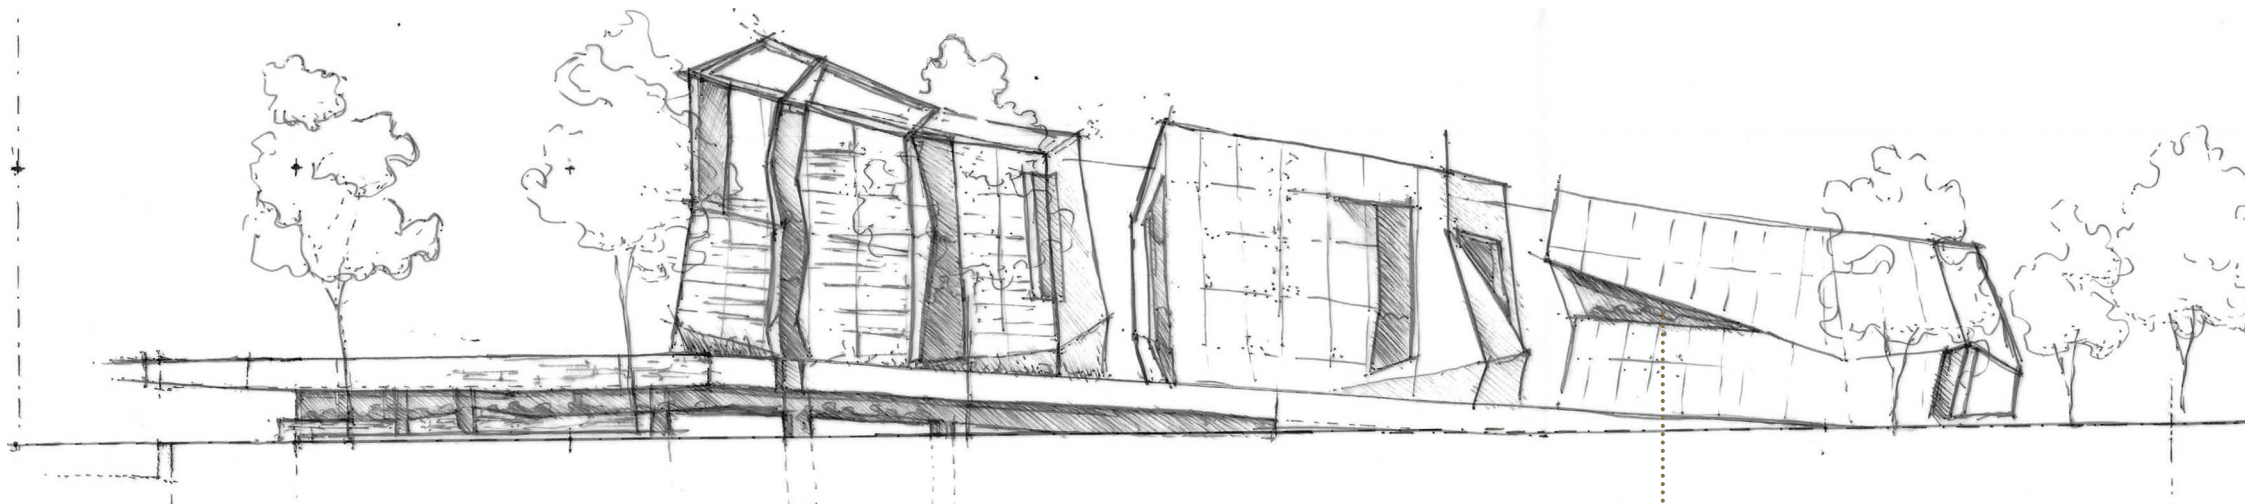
East elevation investigating openings to create visual links to the surrounding context. It further express the facade as an off-shutter concrete stereotomic structure.
